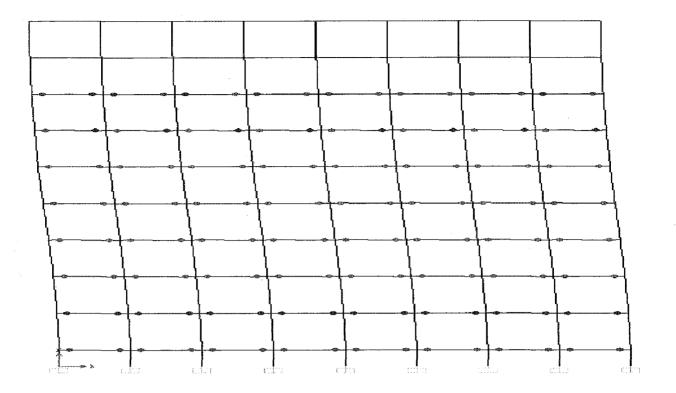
Yield Pattern at Ultimate Point for 9-Storey Building Designed as OMRF in Longitudinal Direction
